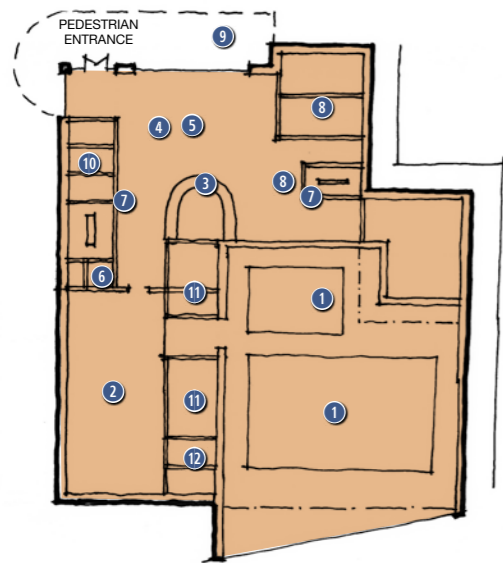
Artist Impression and Sketch Layouts - Potential New Guinea Gap Leisure Offer
